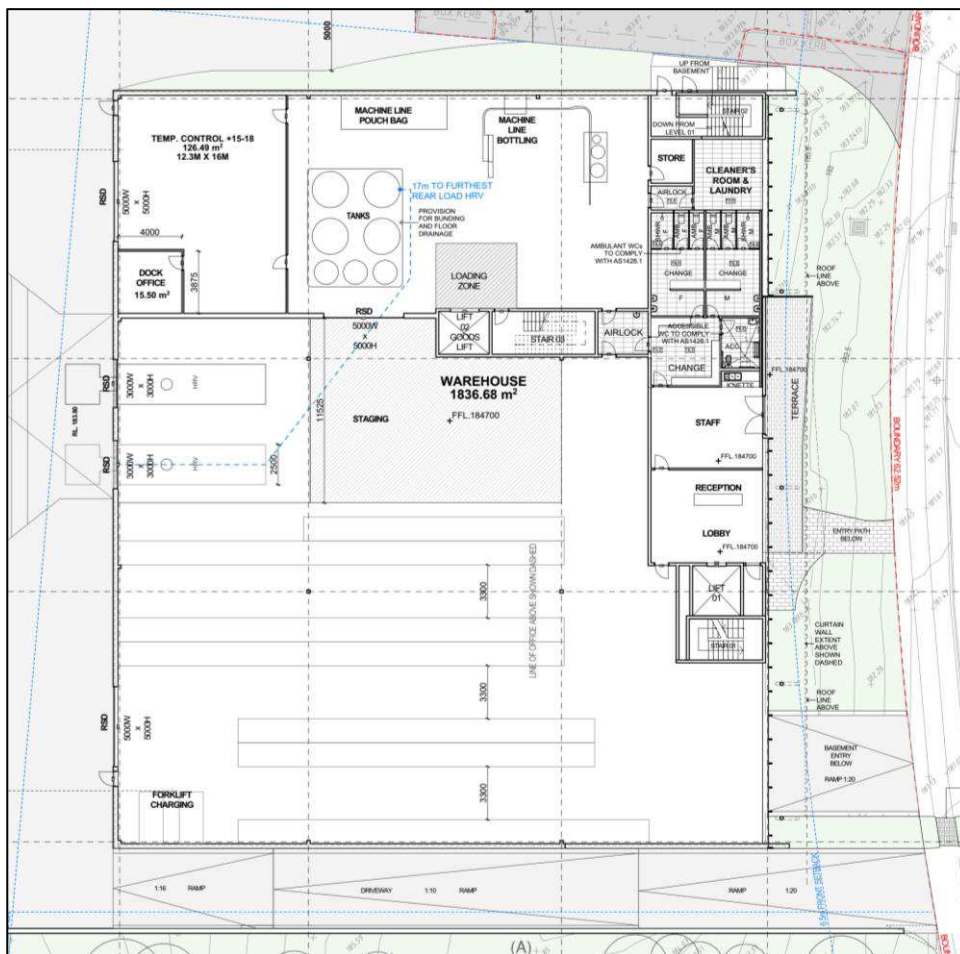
Proposed Site - Ground Floor Architectural Plans
